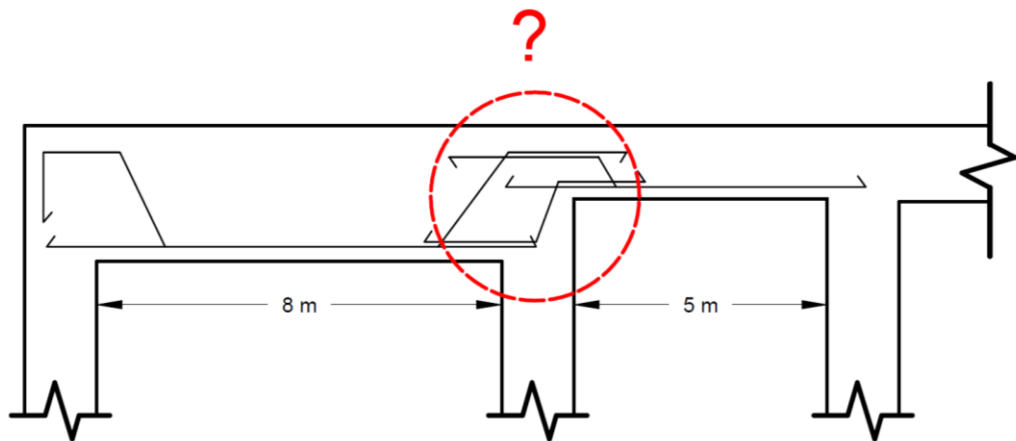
Non-Uniform Span and Cross-Section of a Beam (Ozmen and Unay, 2007)
